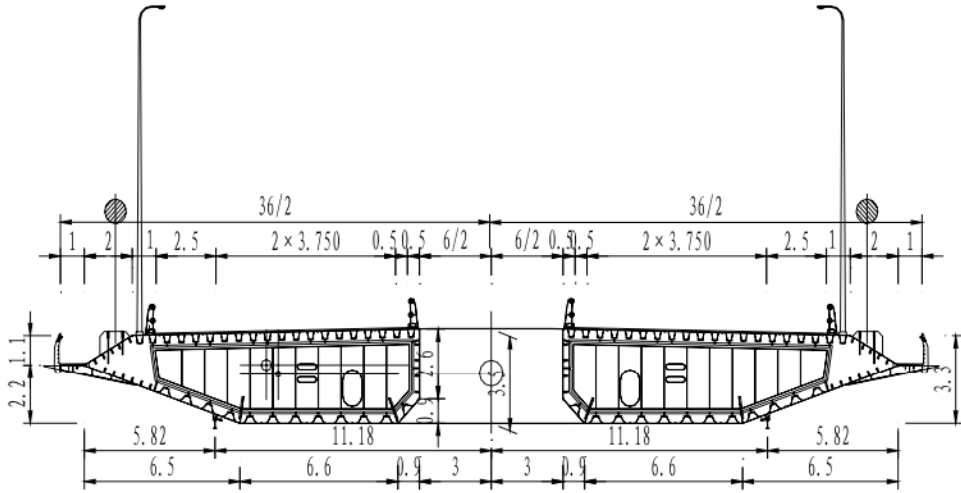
Proposed box girder sections for Xihoumen Bridge, Unit: m (Ge and Xiang, 2009).
